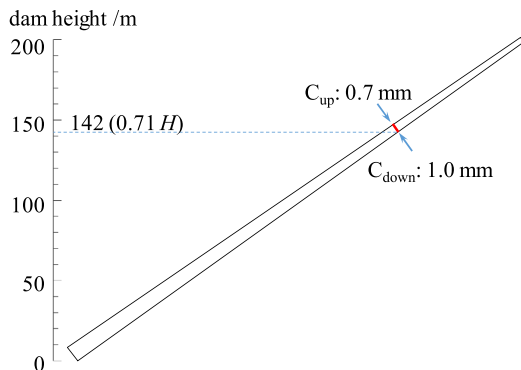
Crack distribution of the reinforced concrete face slab after the earthquake.
